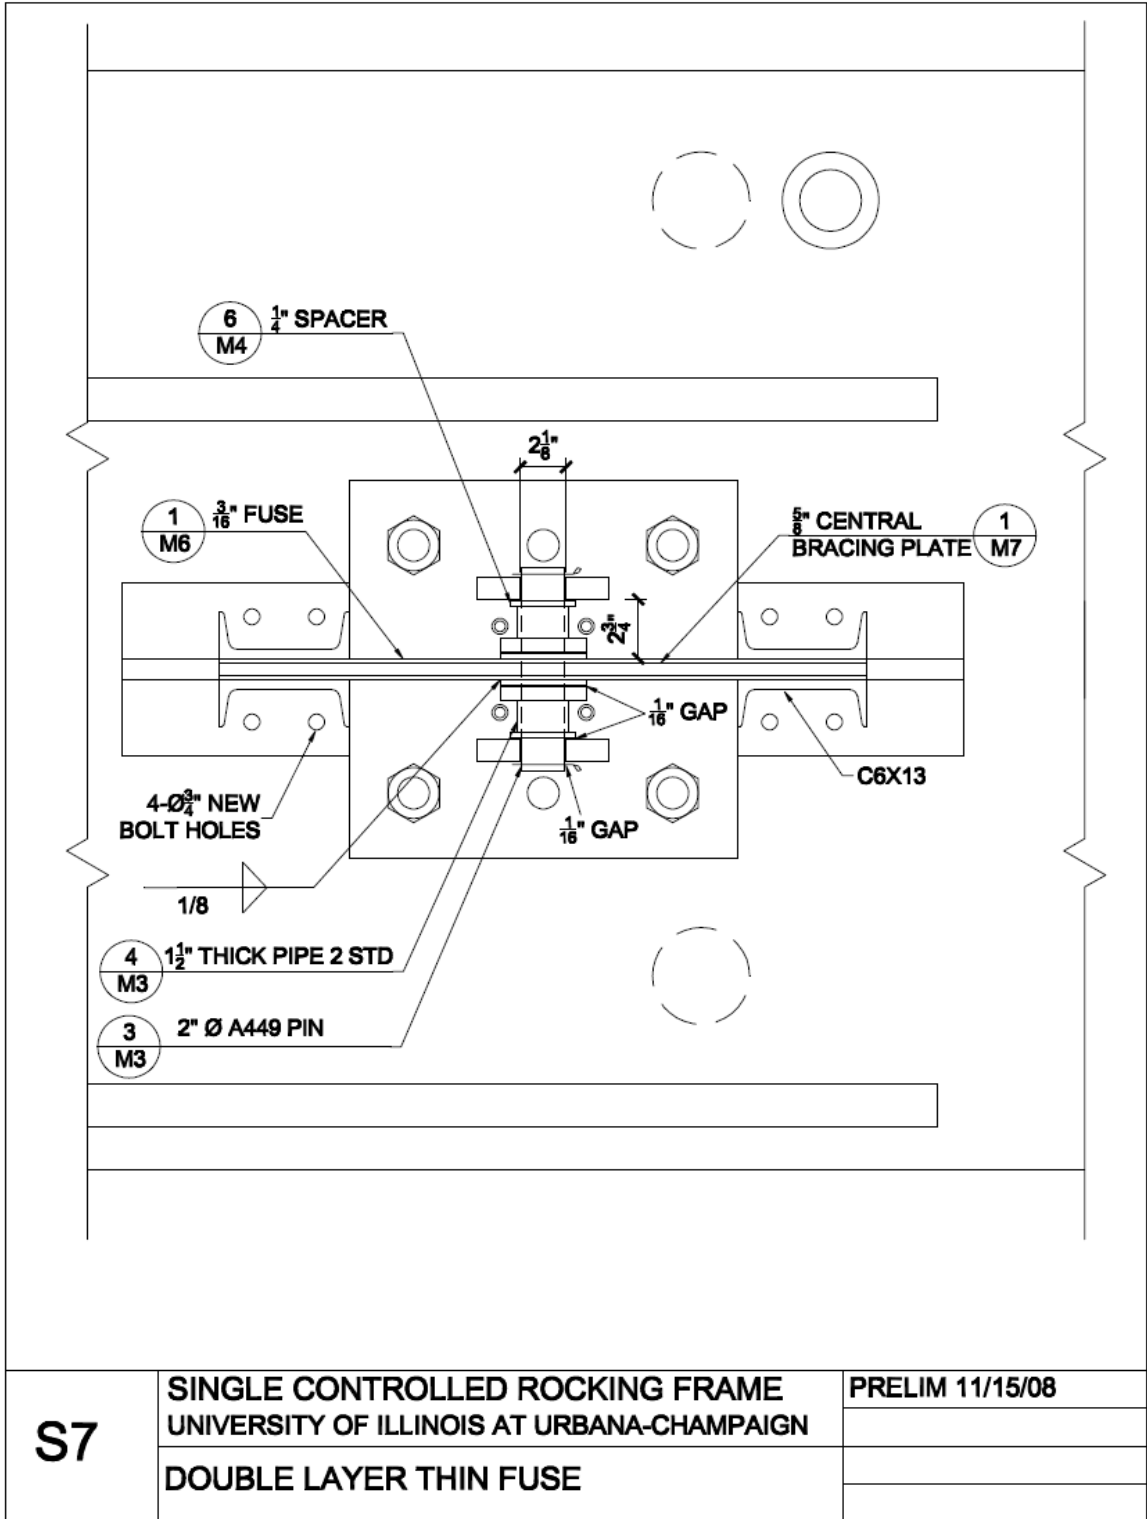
Design Drawing for the Single Frame Configuration – Specimen B2 Plan
